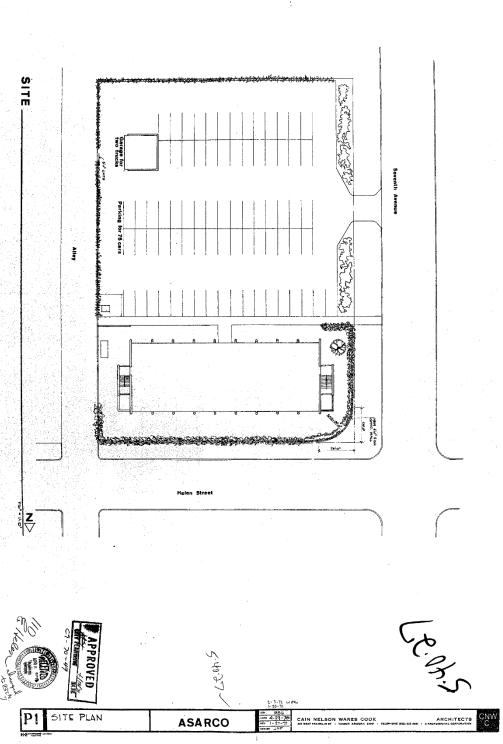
Third story buildout ASARCO Headquarters Site Plan. April 1970. (CNWC. Courtesy of the Fenton Investment Company, Inc.)
